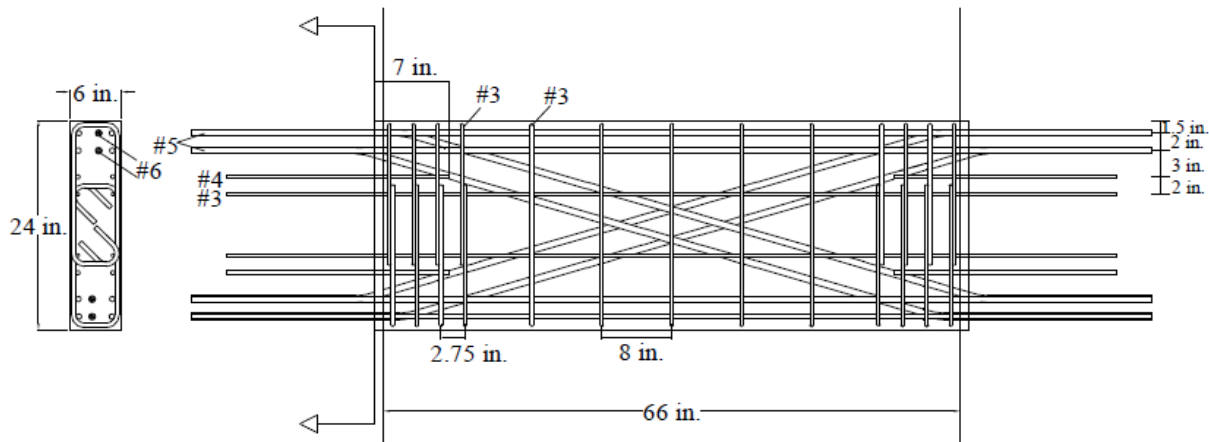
Reinforcement detailing for CB-1 (adapted from Setkit, 2012)
